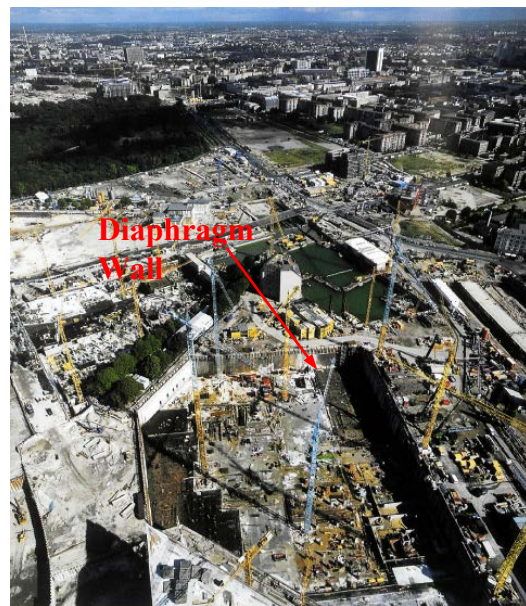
East Slurry wall (Meyerowitz, 2006)
